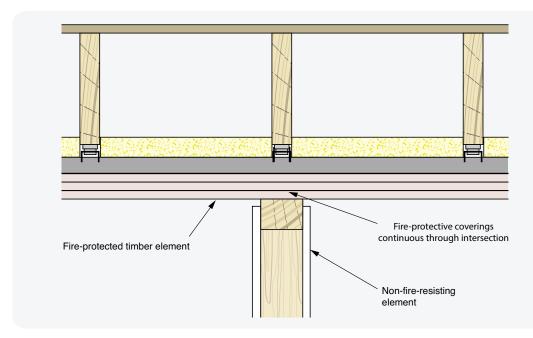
Junction of non-fire-resistant wall and fire-protected timber floor
